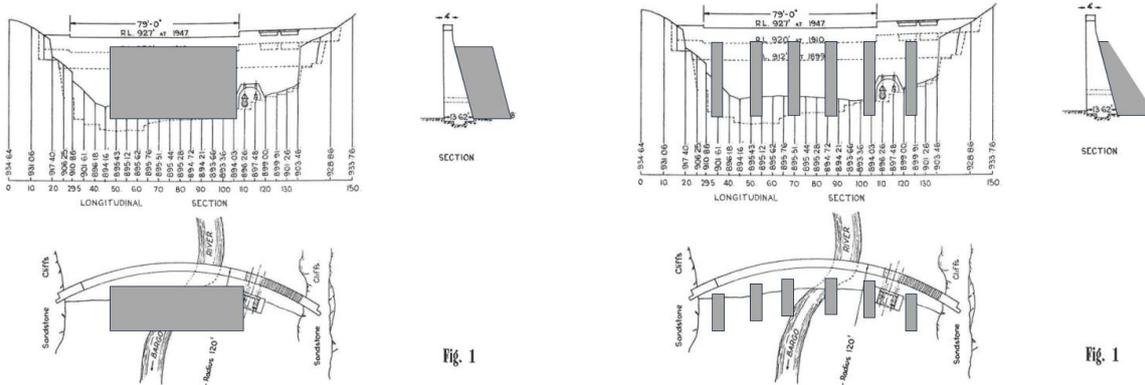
Mass concrete blocks (left), concrete buttress (right) stabilization concepts
